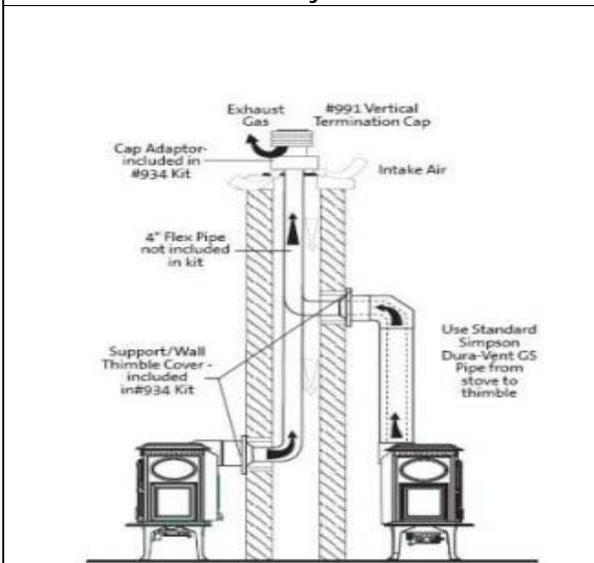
Vent System through a masonry chimney using the Simpson Dura-Vent Chimney Conversion Kit #934. May also be used in listed prefabricated chimneys. Drawing is for illustrative purposes only - DO NOT VENT TWO APPLIANCES INTO A SINGLE CHIMNEY.
